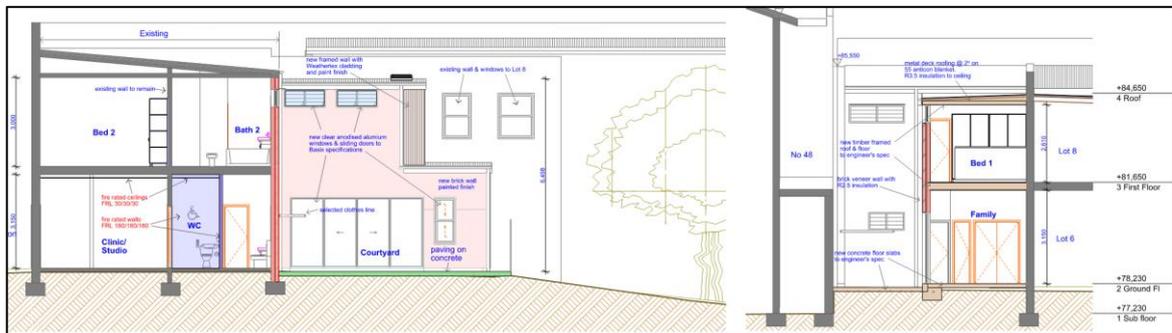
North Elevation and Section - DA/4/2022 - 50-54 Carrington Road, Randwick NSW 2031
